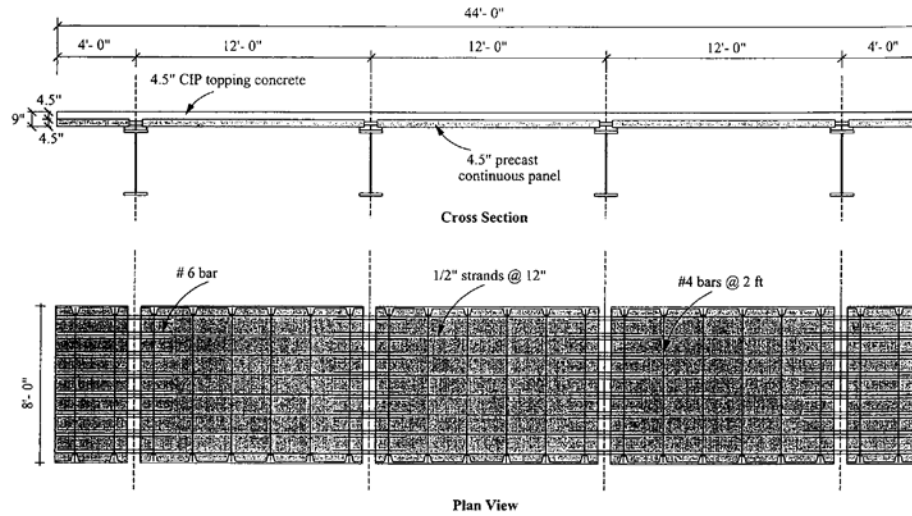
Continuous SIP Subpanel Bridge Deck System
